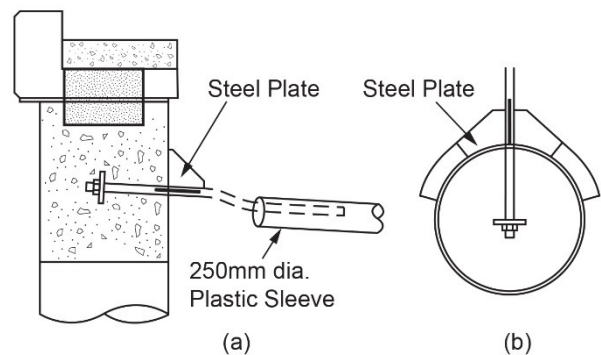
Tie rod with welded fixing plates – (a) section and (b) plan.
